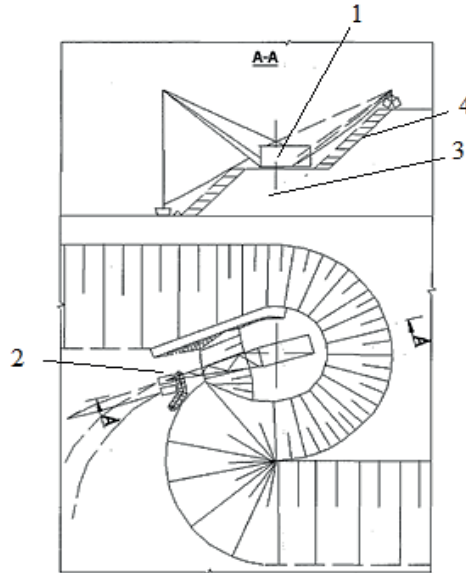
Dumping scheme for container technology with layer-by-layer rock stacking. 1 – lifting machine; 2 – container loading area; 3 – dump tier; 4 – layer-by-layer rock stacking platform.
